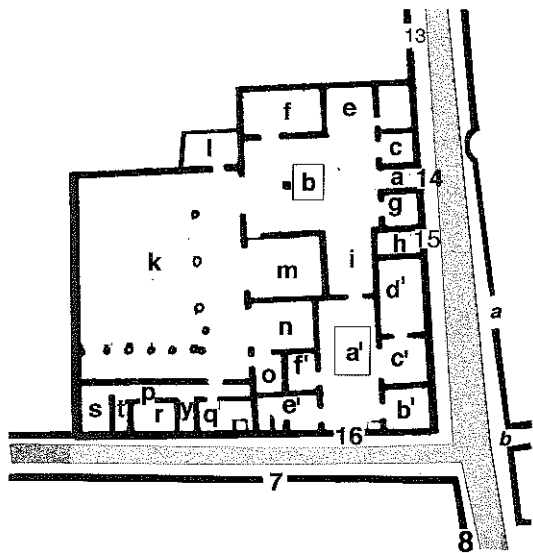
Pompeii, House at IX, 5, 14-16, plan.
